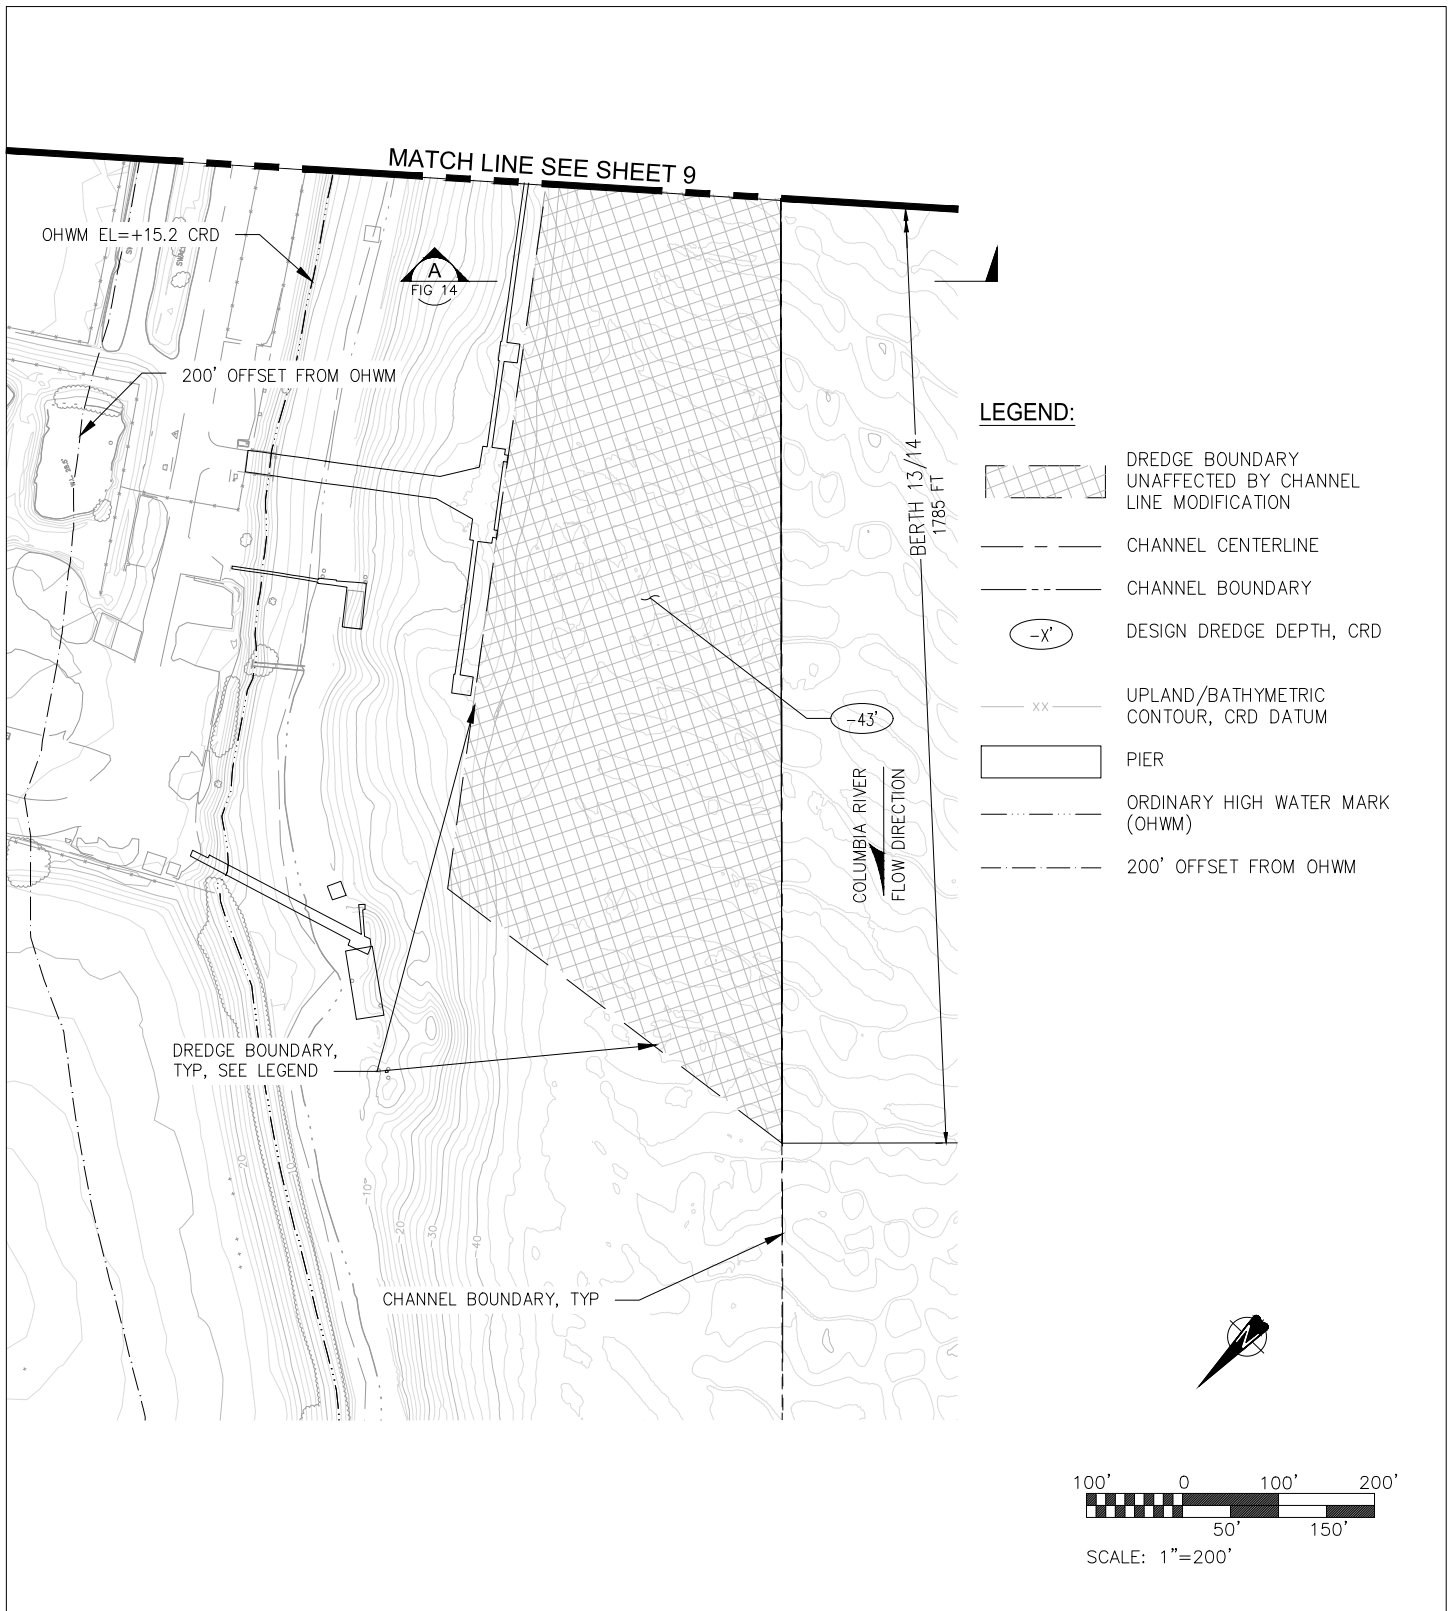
SITE PLAN - BERTH 13/14 SOUTH
